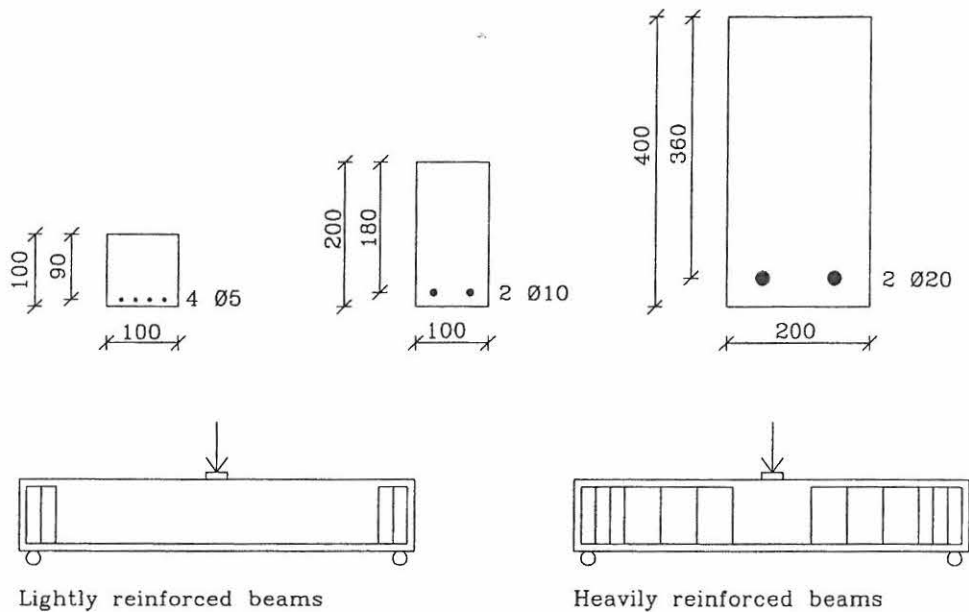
Scaling of cross-section and design of a typical test beam. Units in mm.
